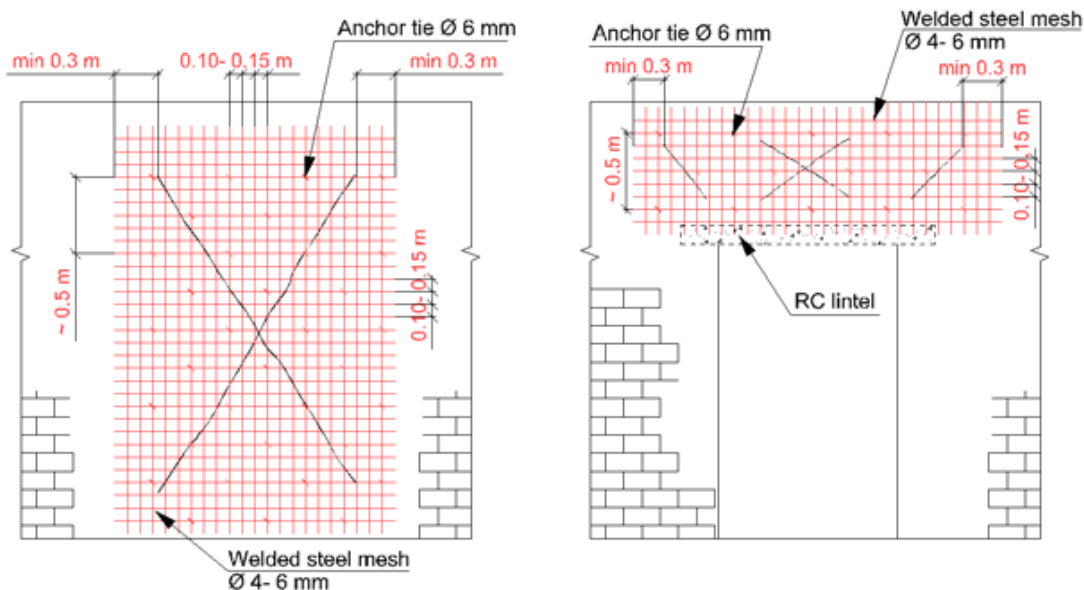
Repair of heavily cracked brick masonry wall with RC coating [51]
